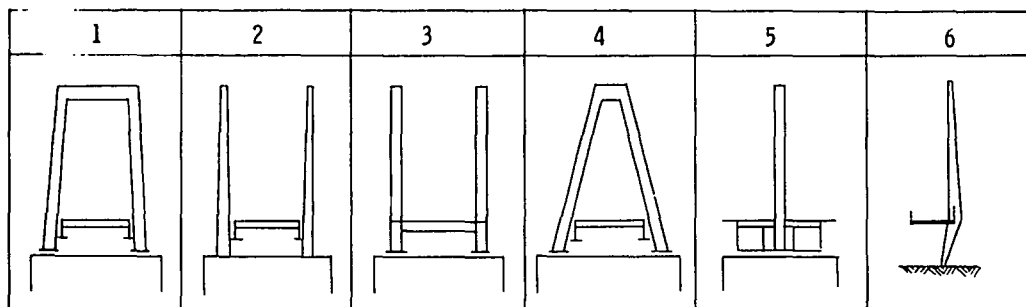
Transverse layout of tower (Troitsky 1988)
